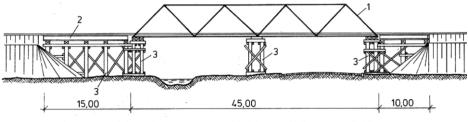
Provisionally reconstructed bridge (Miklin & Sawicki, 1993):
